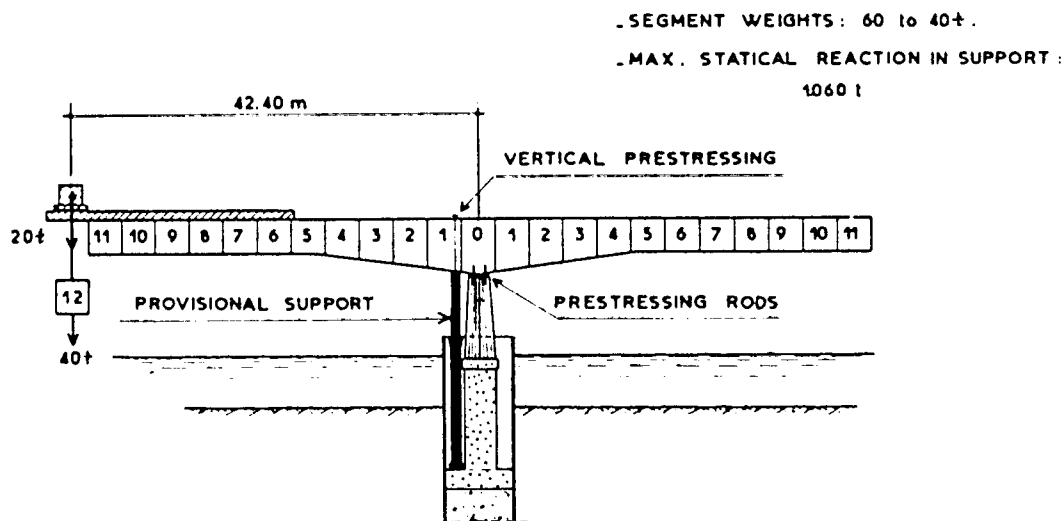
Downstream Paris Belt Bridge, schematic of temporary support and stability of river pier during construction.
